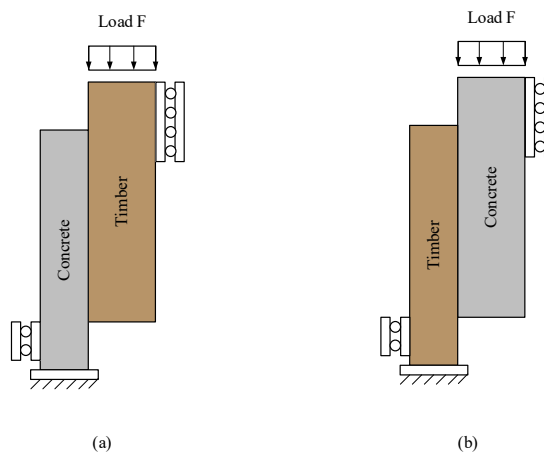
Asymmetric push-out test setup with loading on (a) timber and (b) concrete
